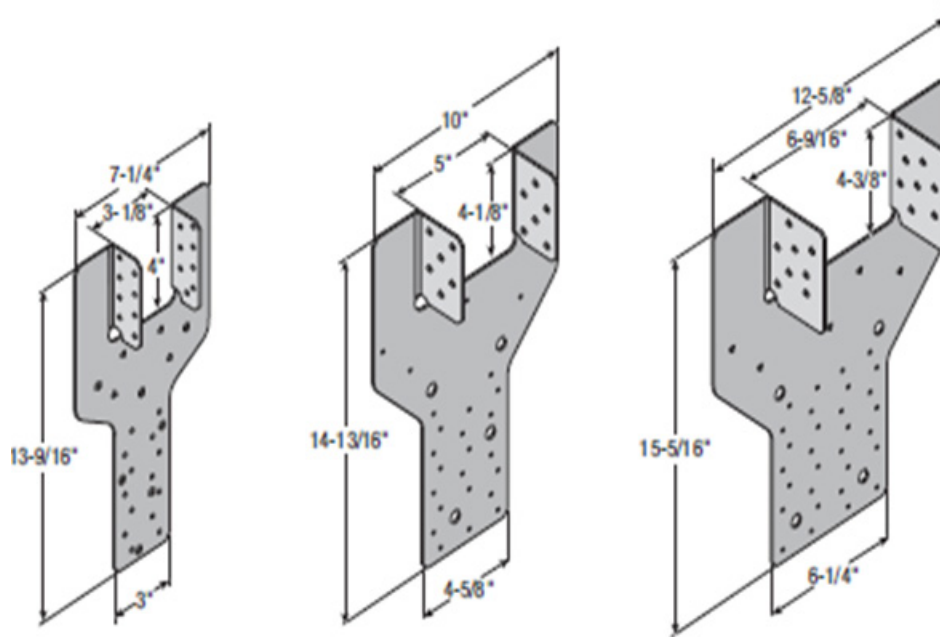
PHGT and PHHGT Post-install Girder Tie Downs
